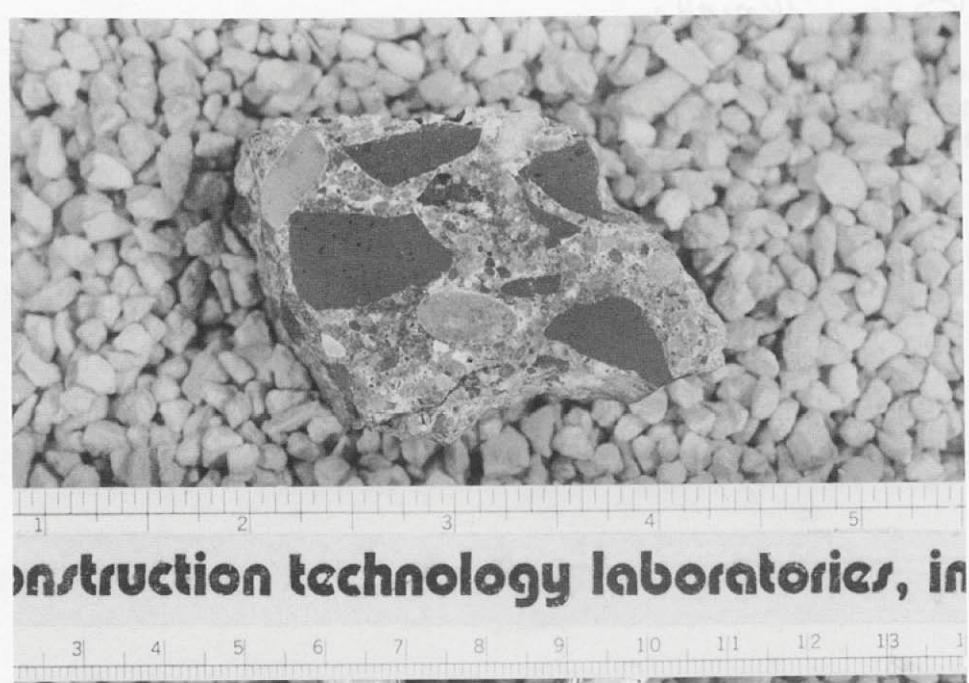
LAPPED SURFACE OF AUTOBAHN CONCRETE FRAGMENT ORIENTED WITH BARRIER IMPRESSION AT TOP OF PHOTOGRAPH.
